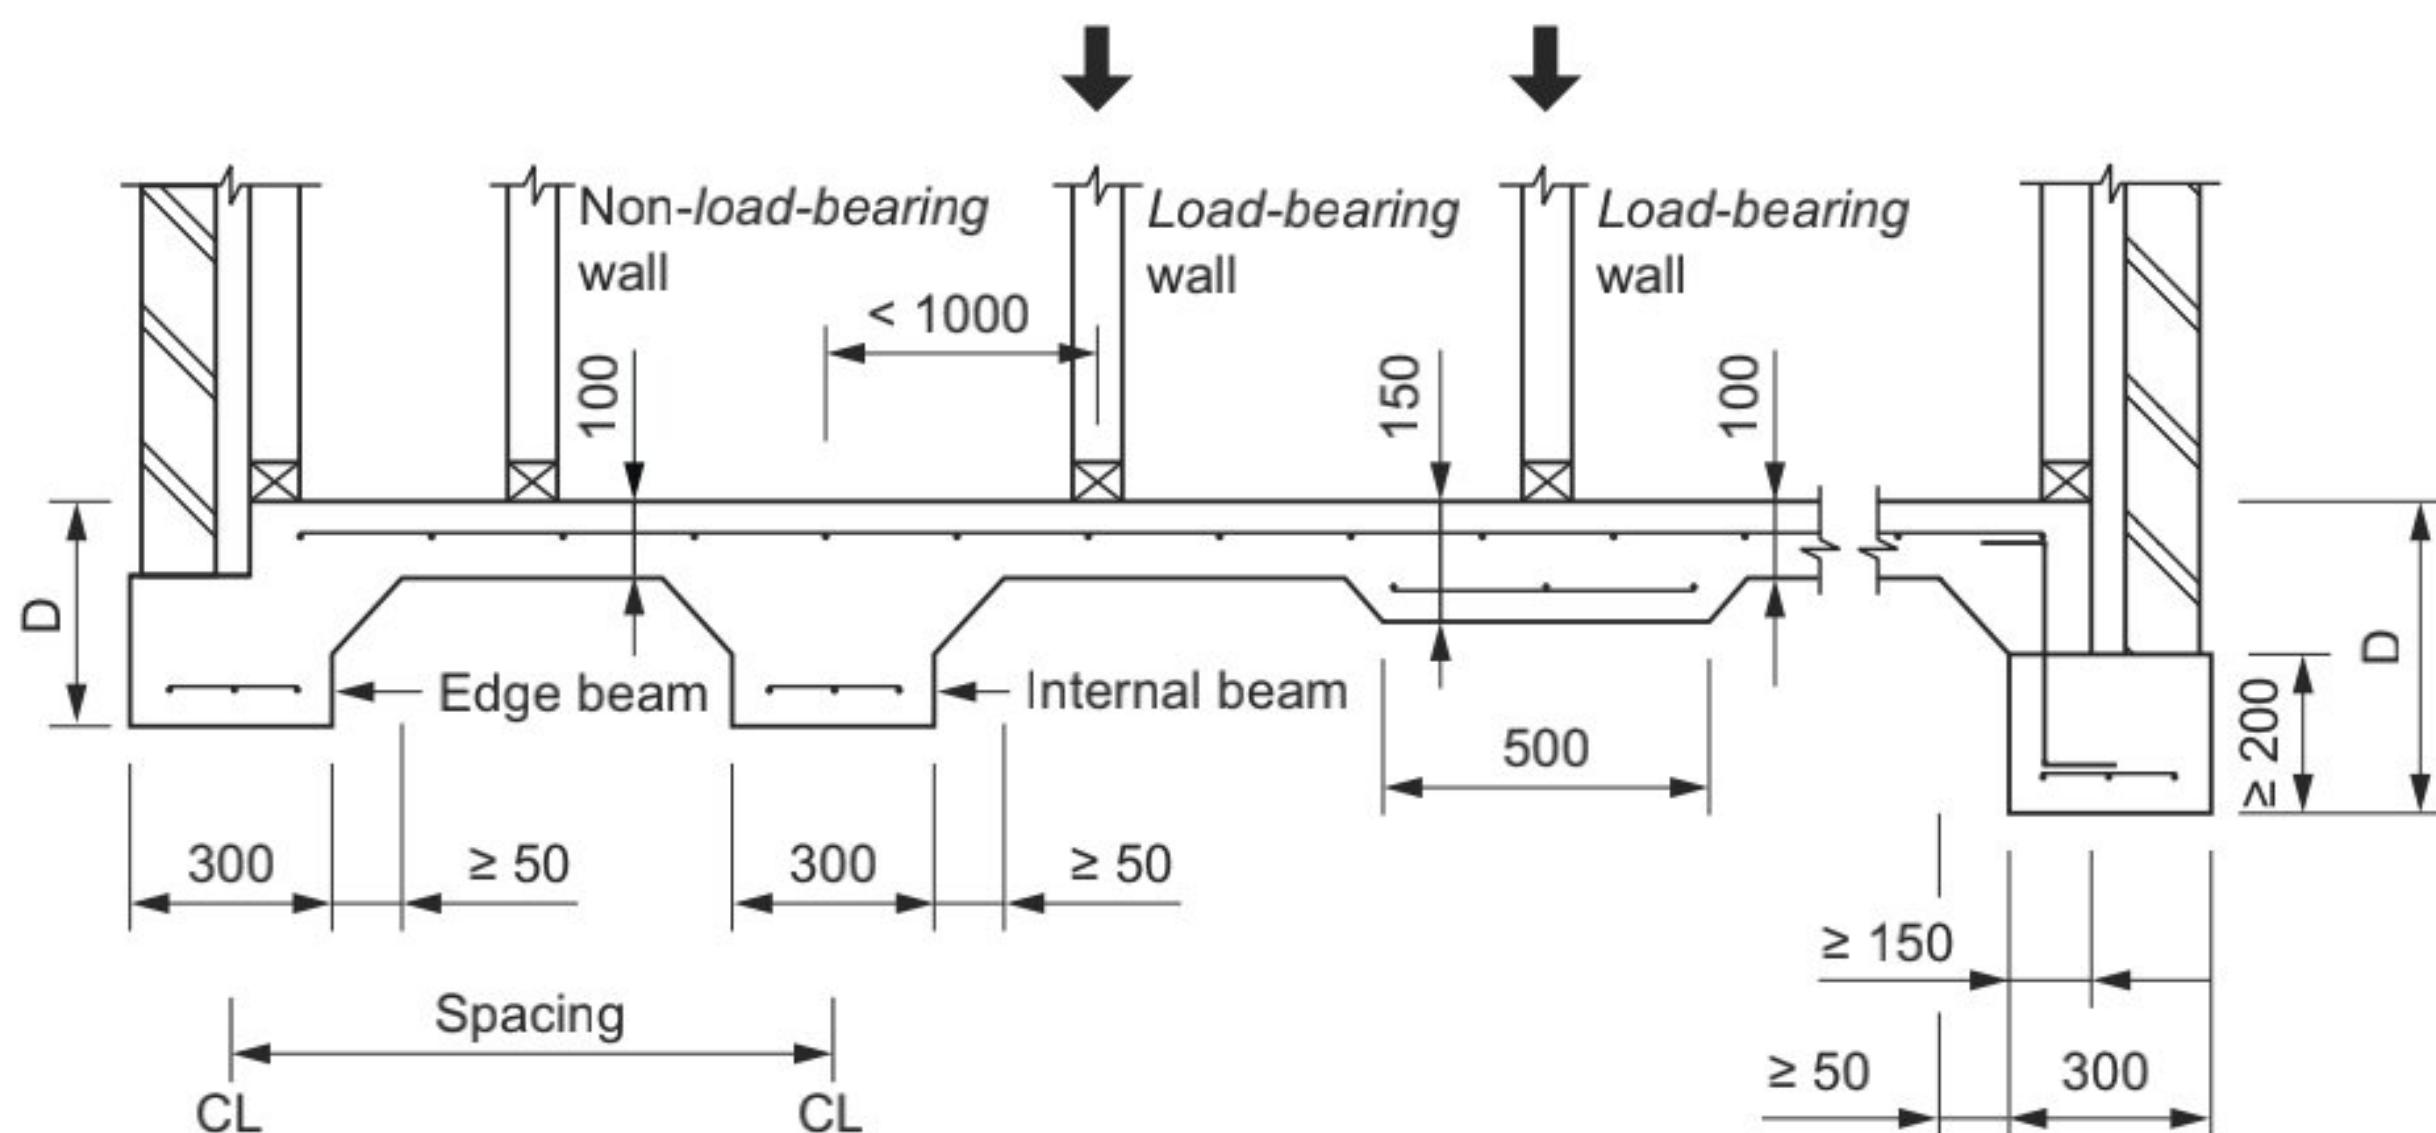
Footing slab and stiffened raft slab details for Class M sites
